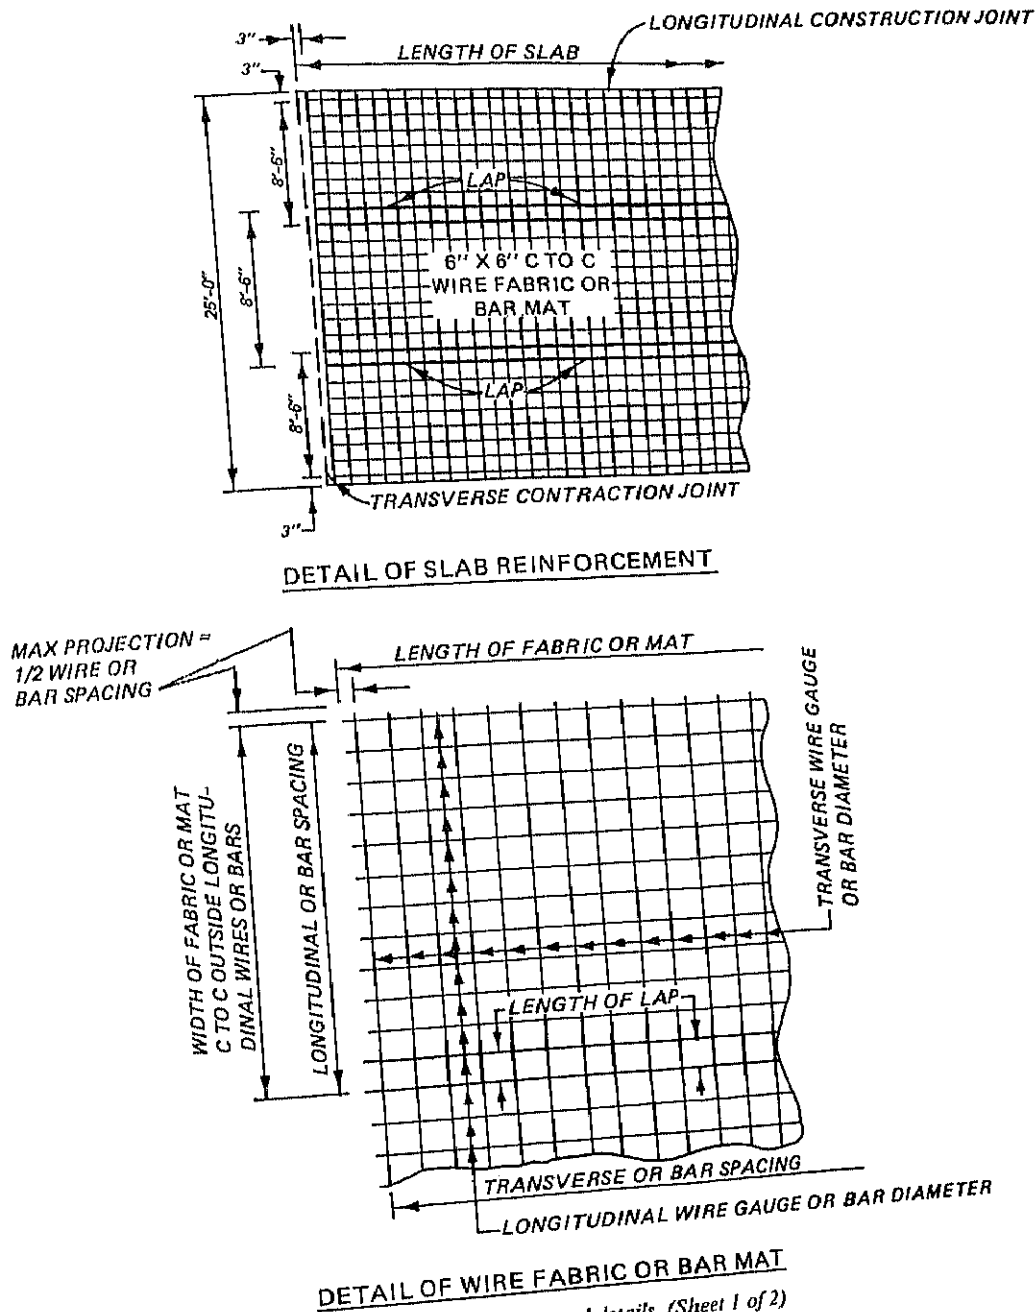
Reinforcing steel details. (Sheet 1 of 2)
